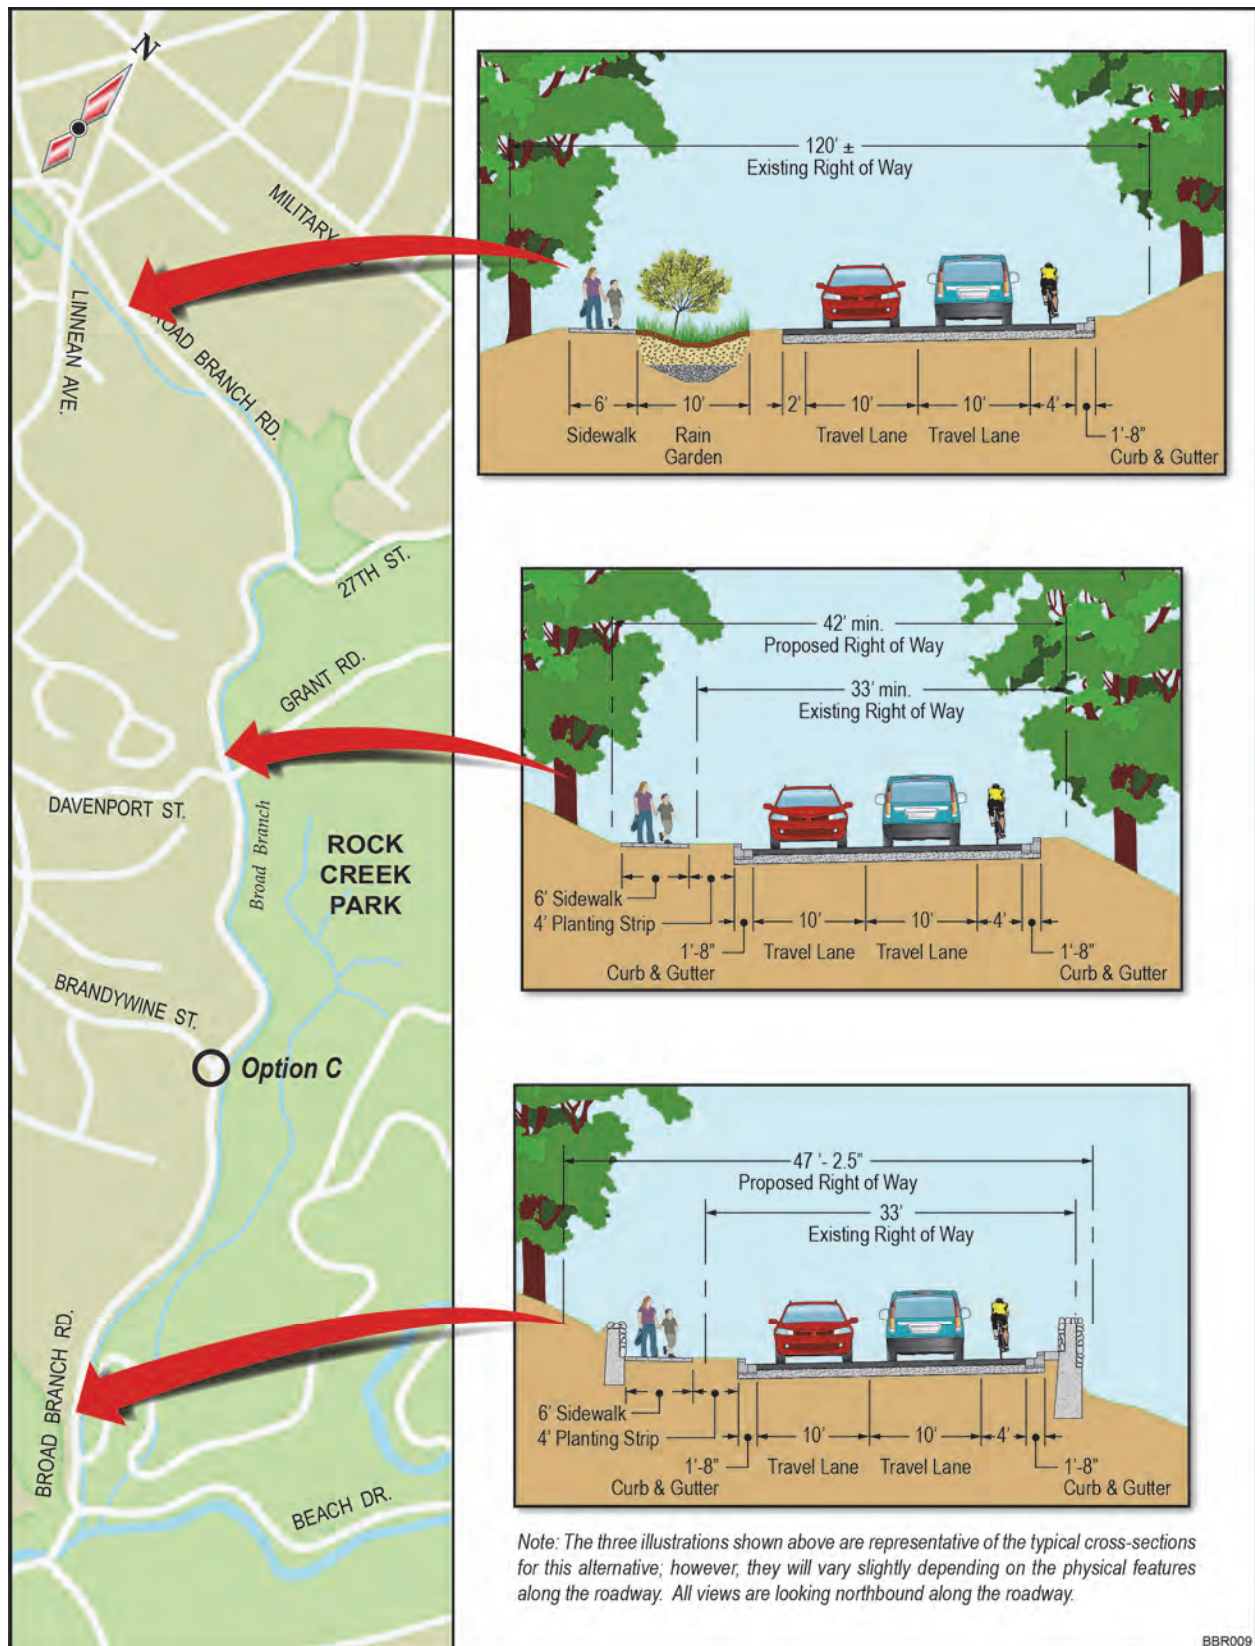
Candidate Build Alternative 4 – Typical Sections
